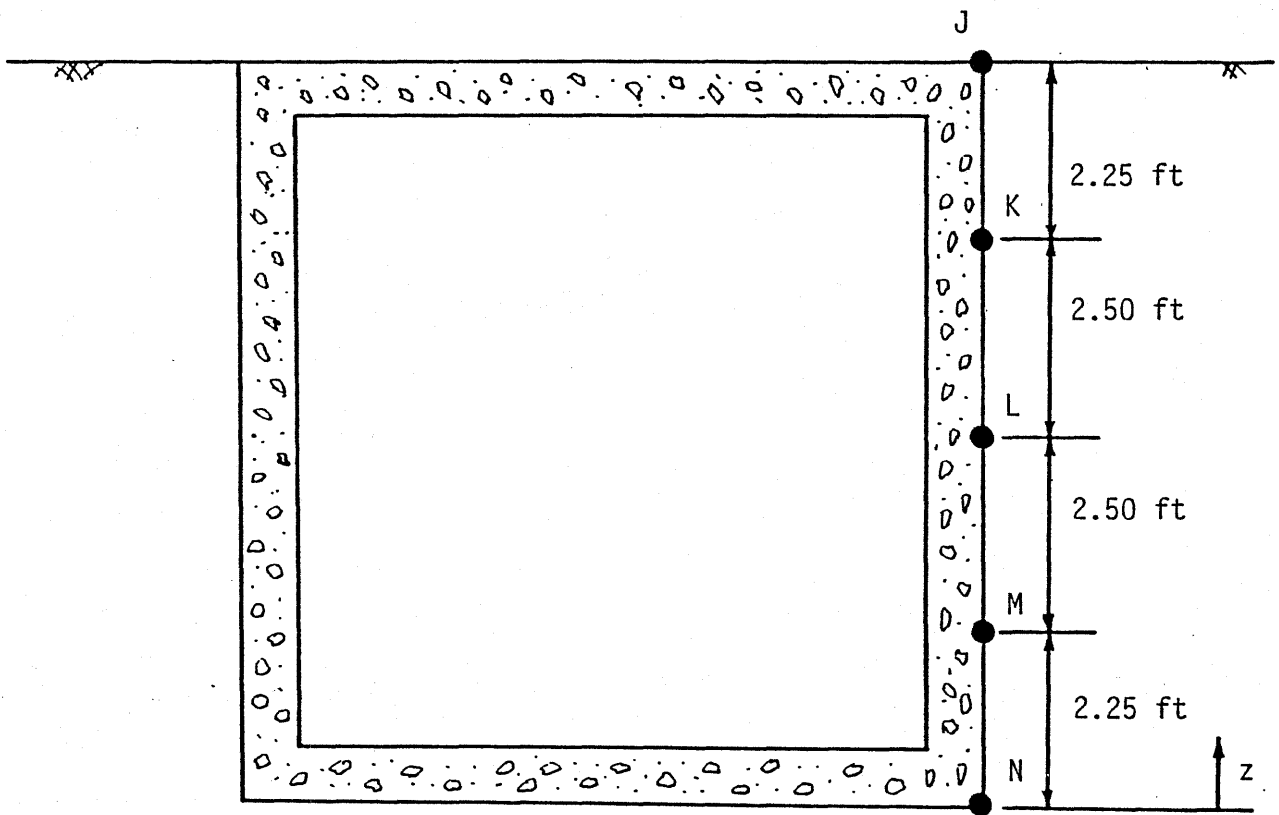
Geometry for Example Illustrating Horizontal Dead Load Pressures by Proposed Method with Arching
